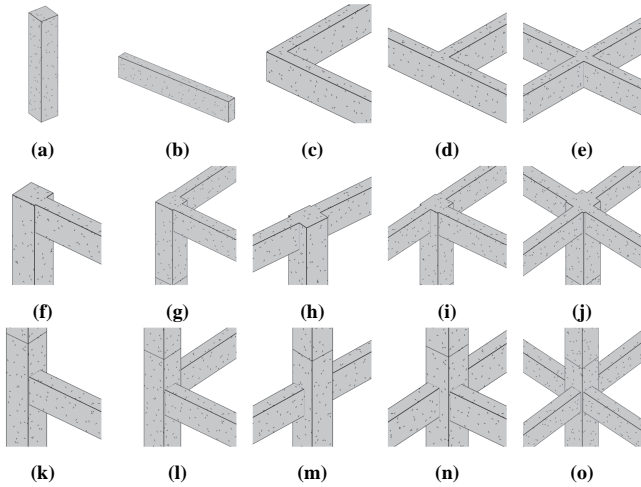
Various structural types in a RC frame: (a) single column; (b) single beam; (c) L beam joint; (d) T beam joint; (e) + beam joint; (f) top floor single beam joint; (g) top floor L joint; (h) top floor opposite joint; (i) top floor T joint; (j) top floor + joint; (k) middle floor single beam joint; (l) middle floor L joint; (m) middle floor opposite joint; (n) middle floor T joint; (o) middle floor + joint.
